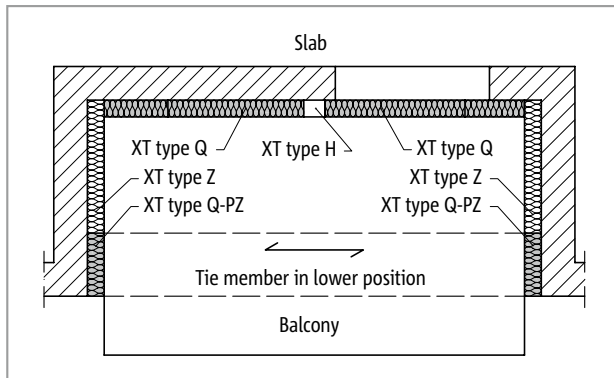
Schöck Isokorb® XT type Q, Q-PZ: Recessed balcony, supported on three sides - symmetric with tie member
